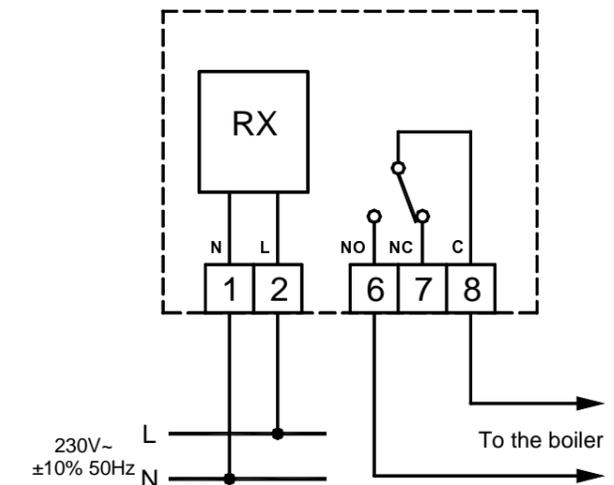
Example of connection to the 'ambient thermostat' of a boiler.
